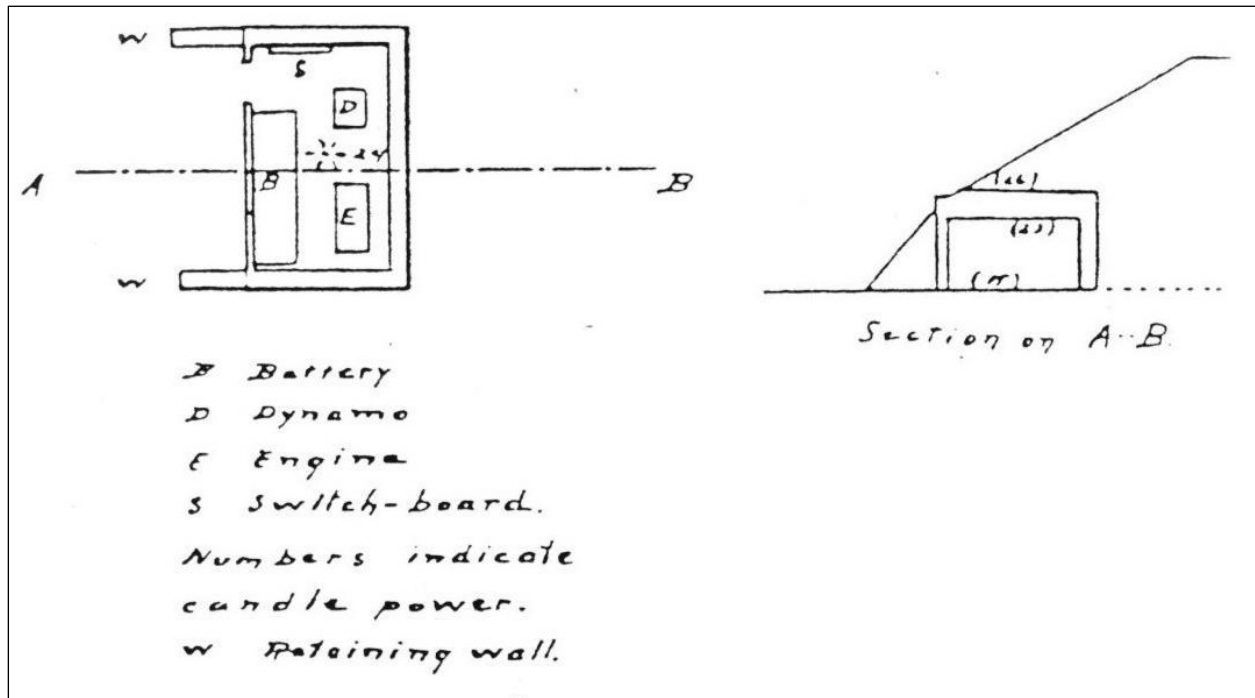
"Plan of Mortar Battery, Davids Island, N.Y., Showing Arrangement of Proposed Plant for Electric Lighting," January 1897. Sketch plan of proposed lighting system for the Mortar Battery, showing planned powerhouse. Record Group 77, National Archives, College Park, MD.
